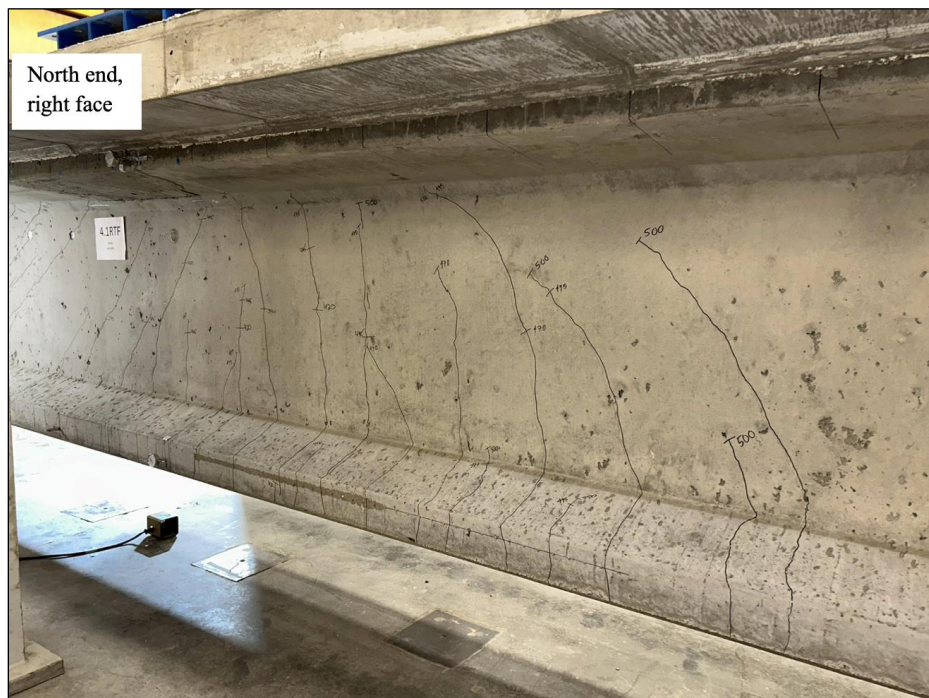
Photo. Test 4.1.S (repair 4.1LBZ, 4.1RTF, 4.1LTF, 4.4LTF) flexural and shear-flexural cracks around the innermost spreader beam support, not extending into repair 4.1RTF at 500 kip (right face of girder pictured).
